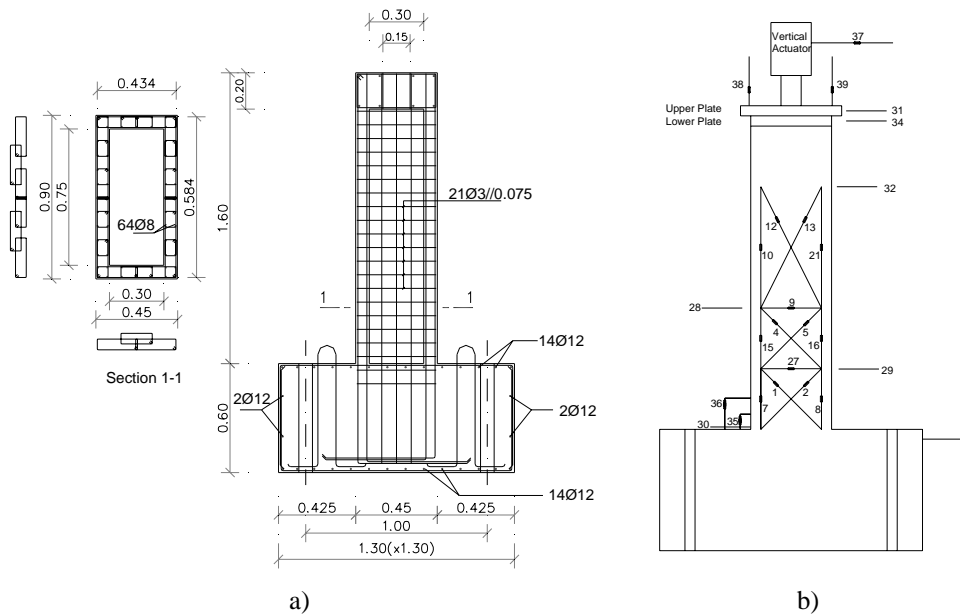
Hollow RC piers: a) geometry of specimen and b) lateral LVDT layout.
